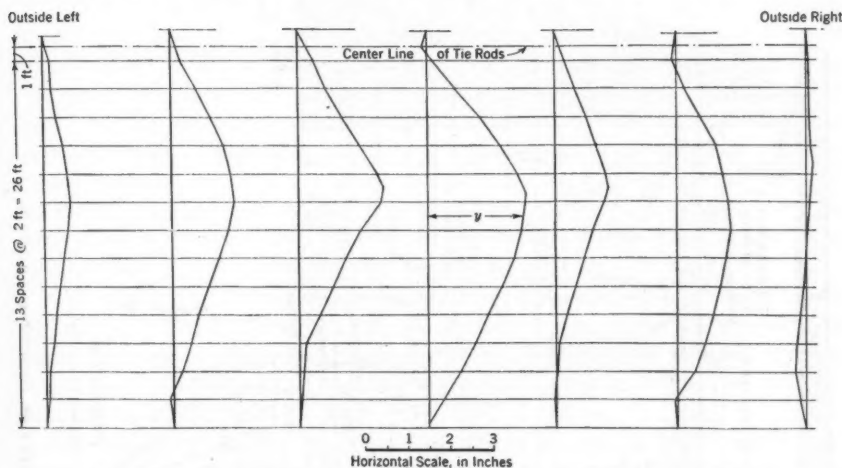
PERMANENT DEFORMATION OF TEST PILES FACING TEST WALL.
